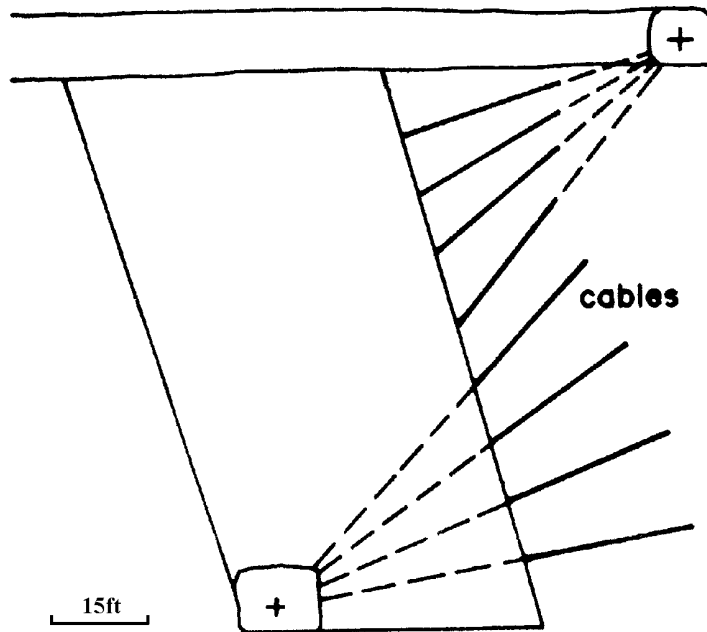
a Cables using to reinforce ground before mining (Fuller, 1983)
